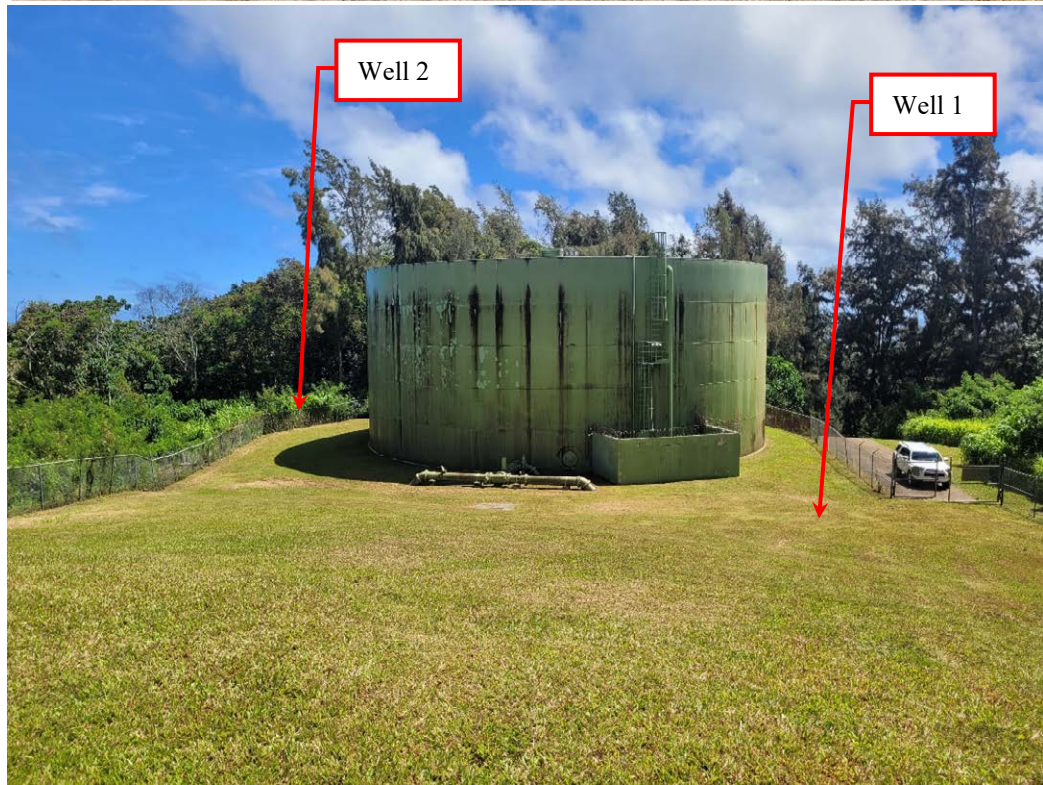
Photos of Existing Gate and 2.0 MG Water Tank
